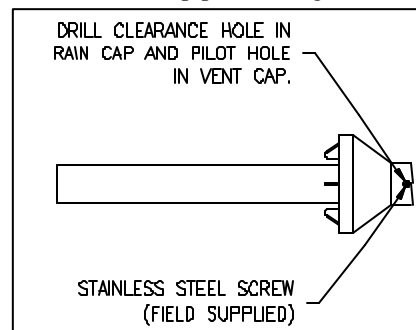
Dimensional Layout of Concentric Vent Kit
